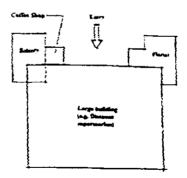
Building Scale Design Criteria (2)(c)(vii) of this section, Small-Scale Additions.
